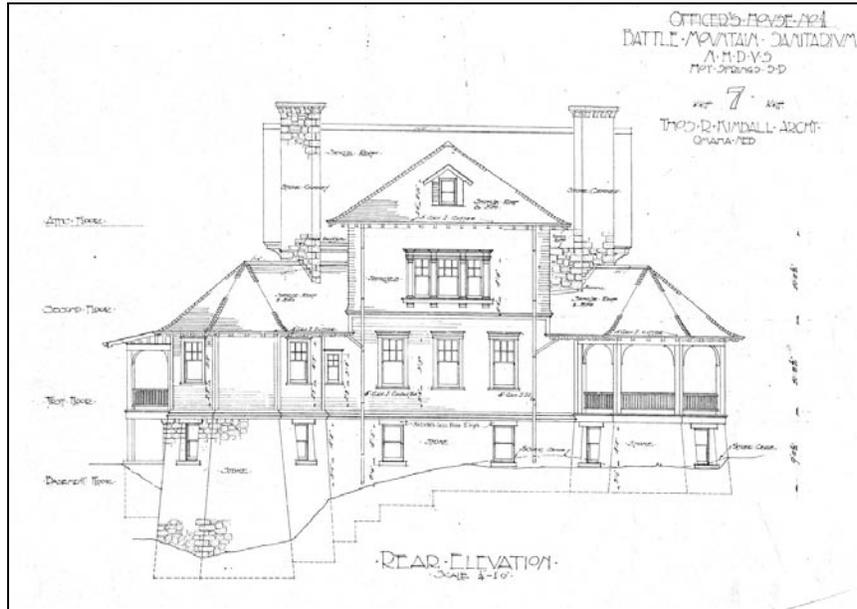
Thomas Rogers Kimball, Rear Elevation, "Officer's House No. 1."
